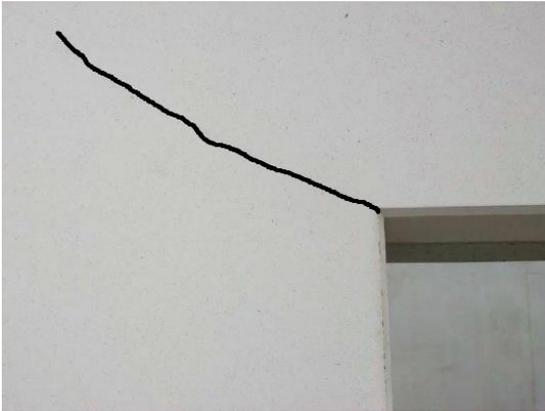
Crack originating from a corner of an opening (crack highlighted for clarity)
